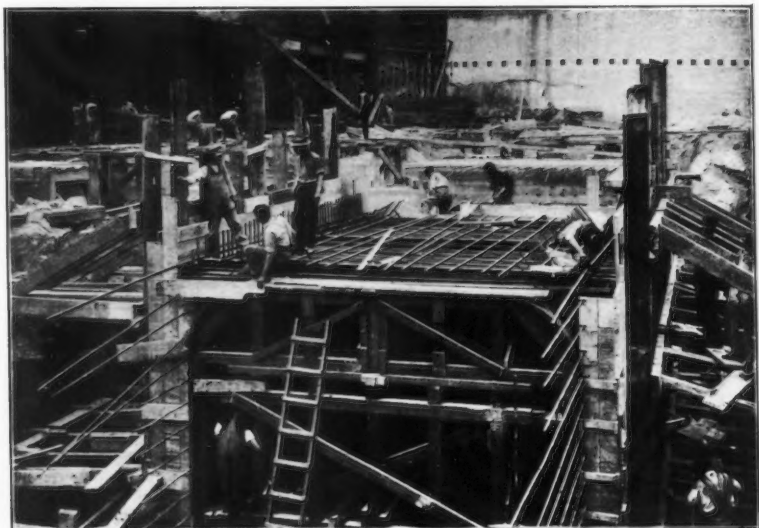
TRUCKING SUBWAY DURING CONSTRUCTION.
